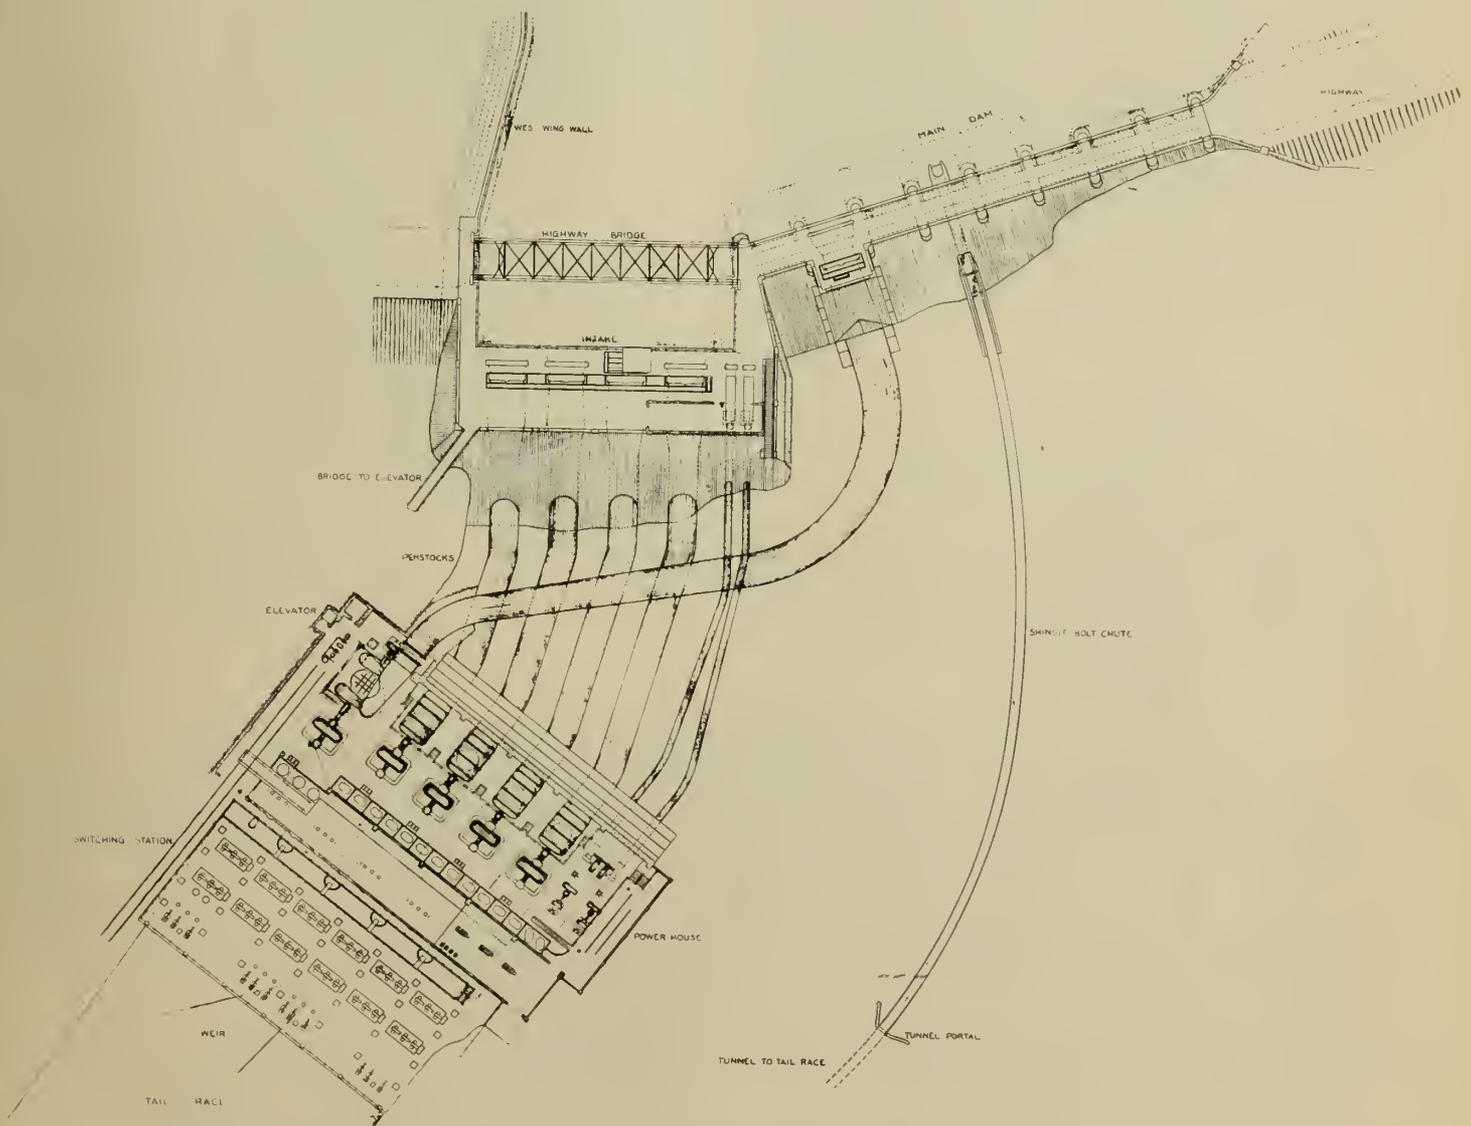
Stave Falls Power Development—General Plan of Intake Dam, Main Dam, Penstocks and Generating Station.
